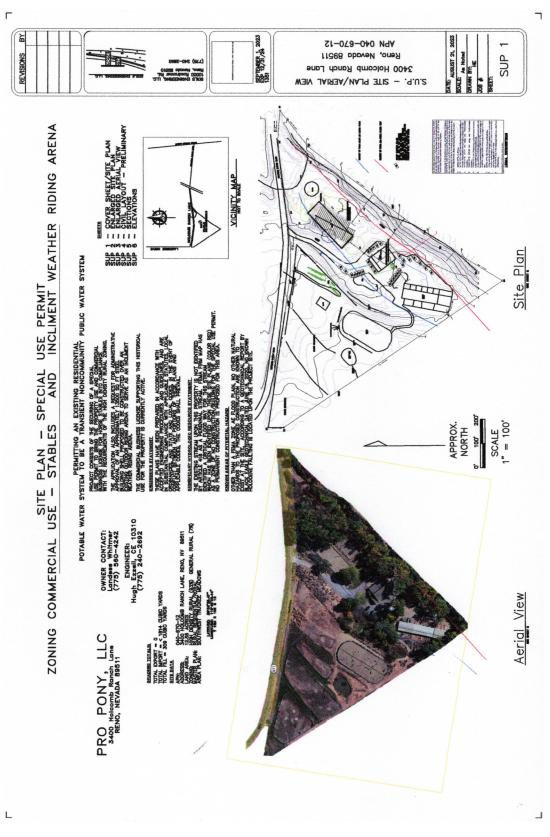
Site Plan and Aerial View - Please see attached 24"x36" Sheets for clear view
